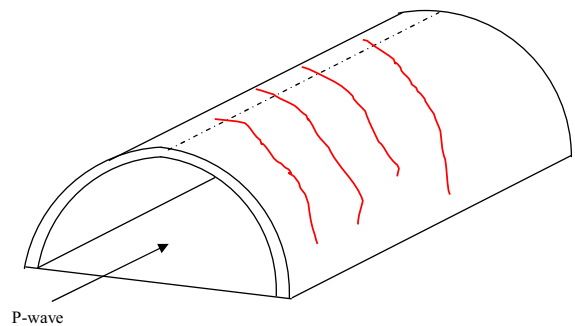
Transverse crack due to propagation of P-wave along longitudinal direction
